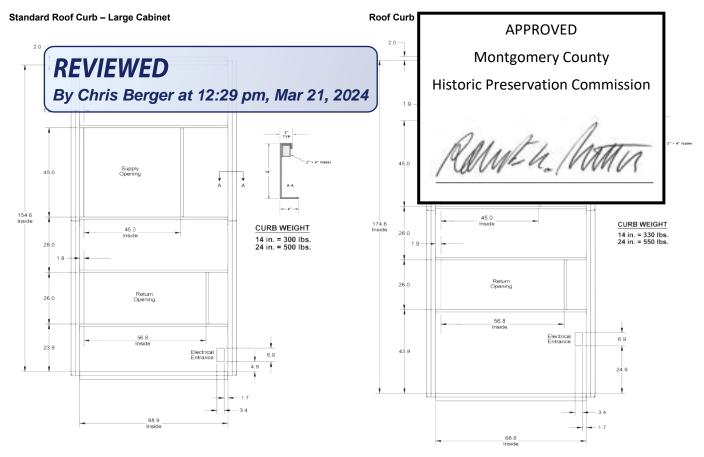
Roof Curb Assembly (DPS 007-015, 016-028) with CORE ERV
